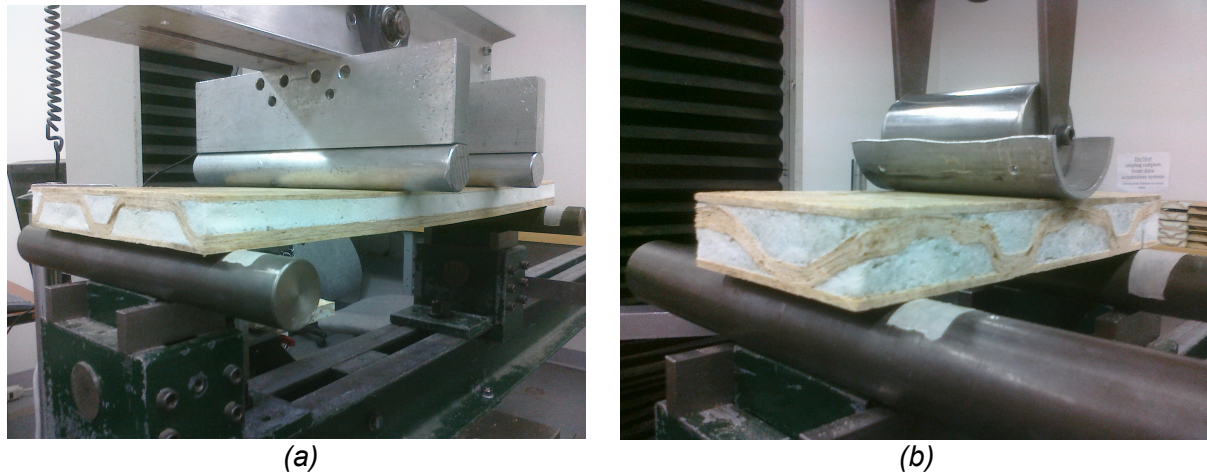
(a) Longitudinal flexure test showing foam. (b) Transverse core shear flexure test.
